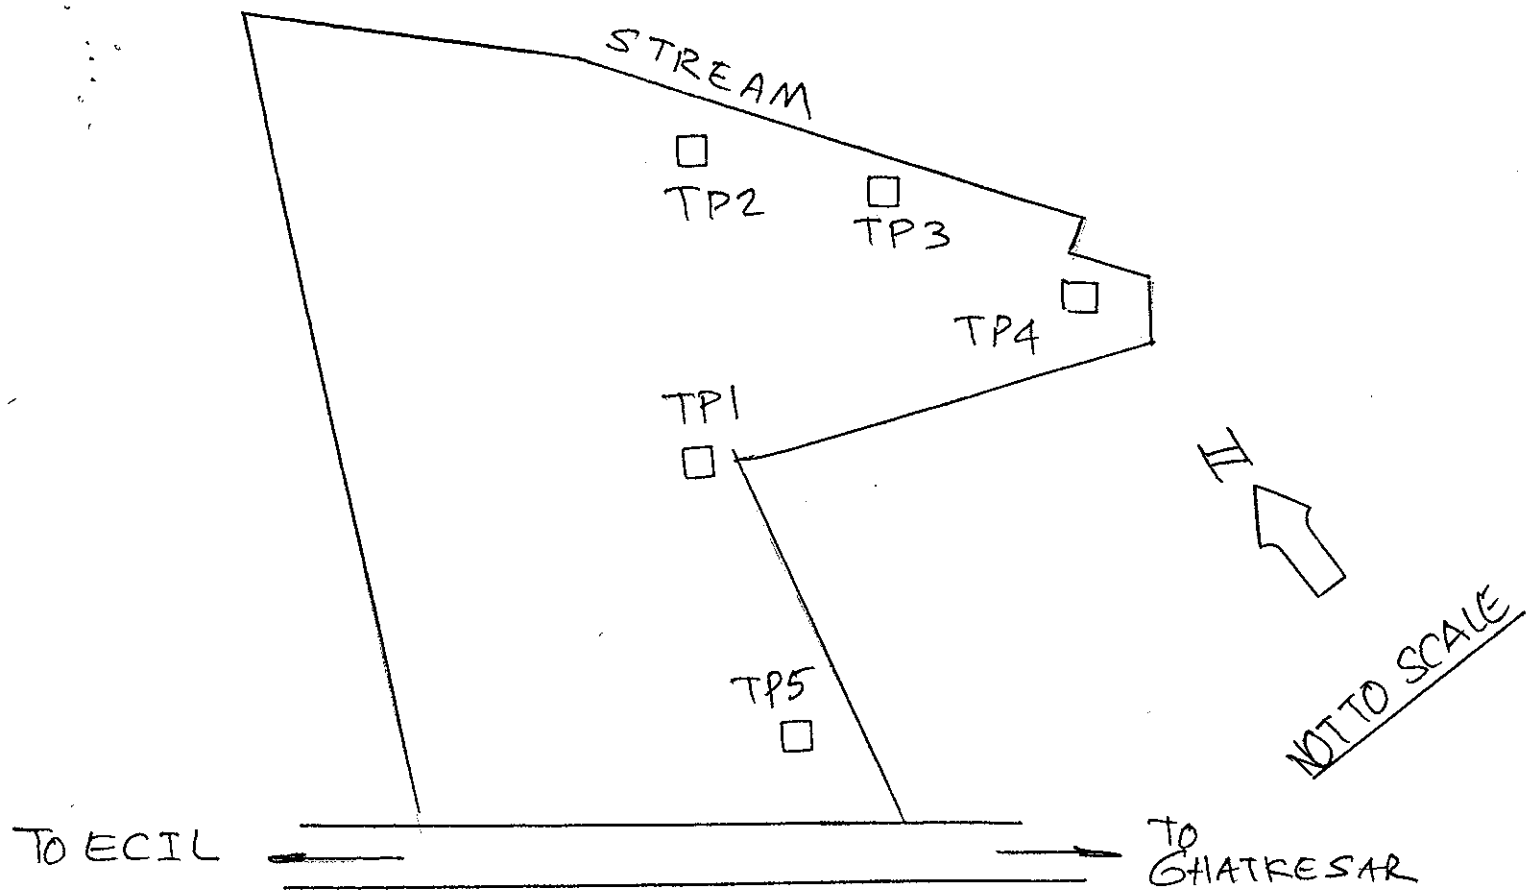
SITE PLAN OF PROPOSED BUILDINGS AT RAMPALLY, KEESARA (M), R.R.D.T.
